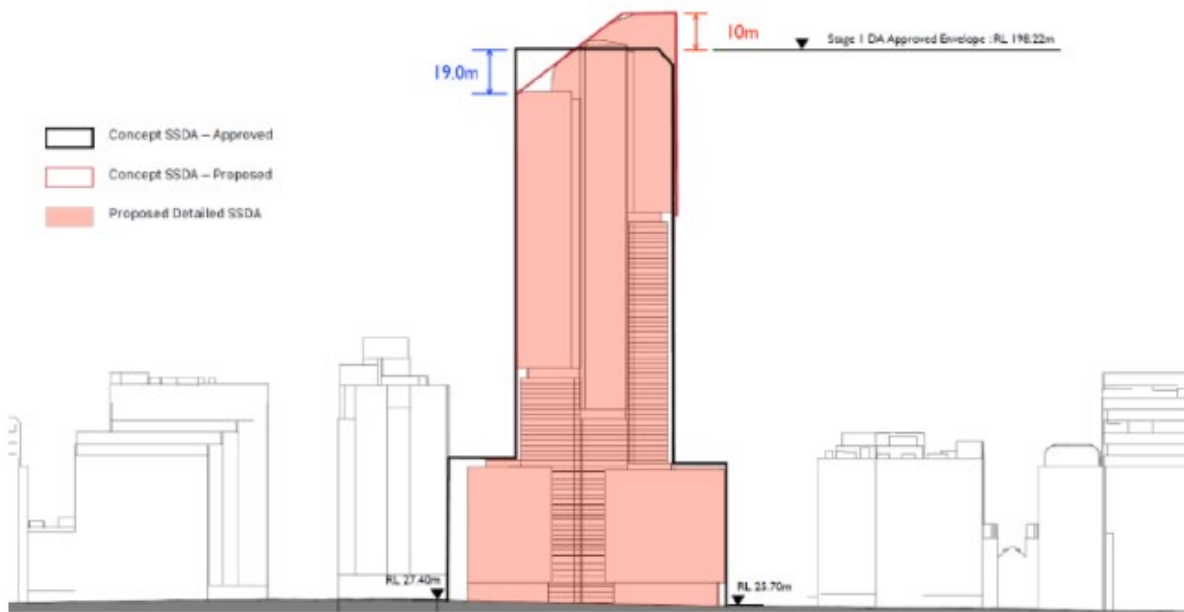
| Proposed variations to approved building envelope. Concept SSDA outlined in black, Concept Modification SSD outlined in red and proposed Detailed Design SSDA shaded red. (Source: Ethos Urban EIS for D/2024/854)
